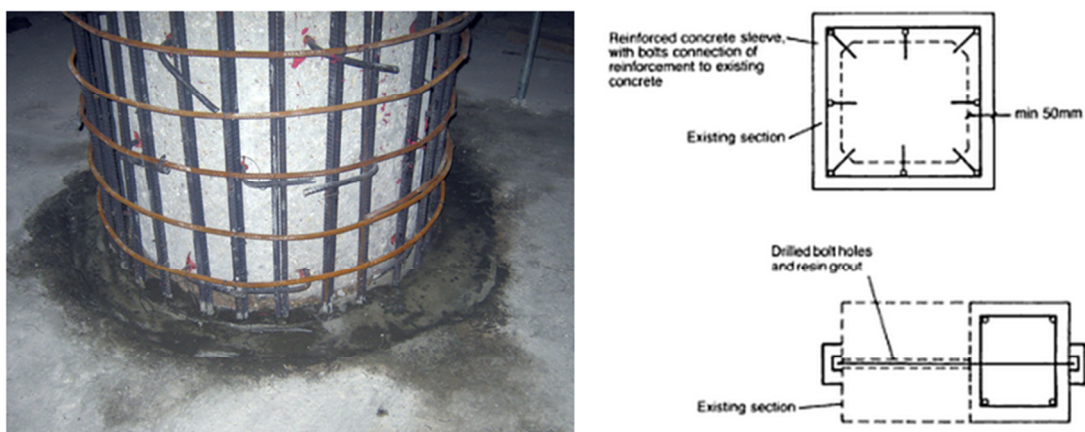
Reinforced concrete column concrete jacketing with additional reinforcement
